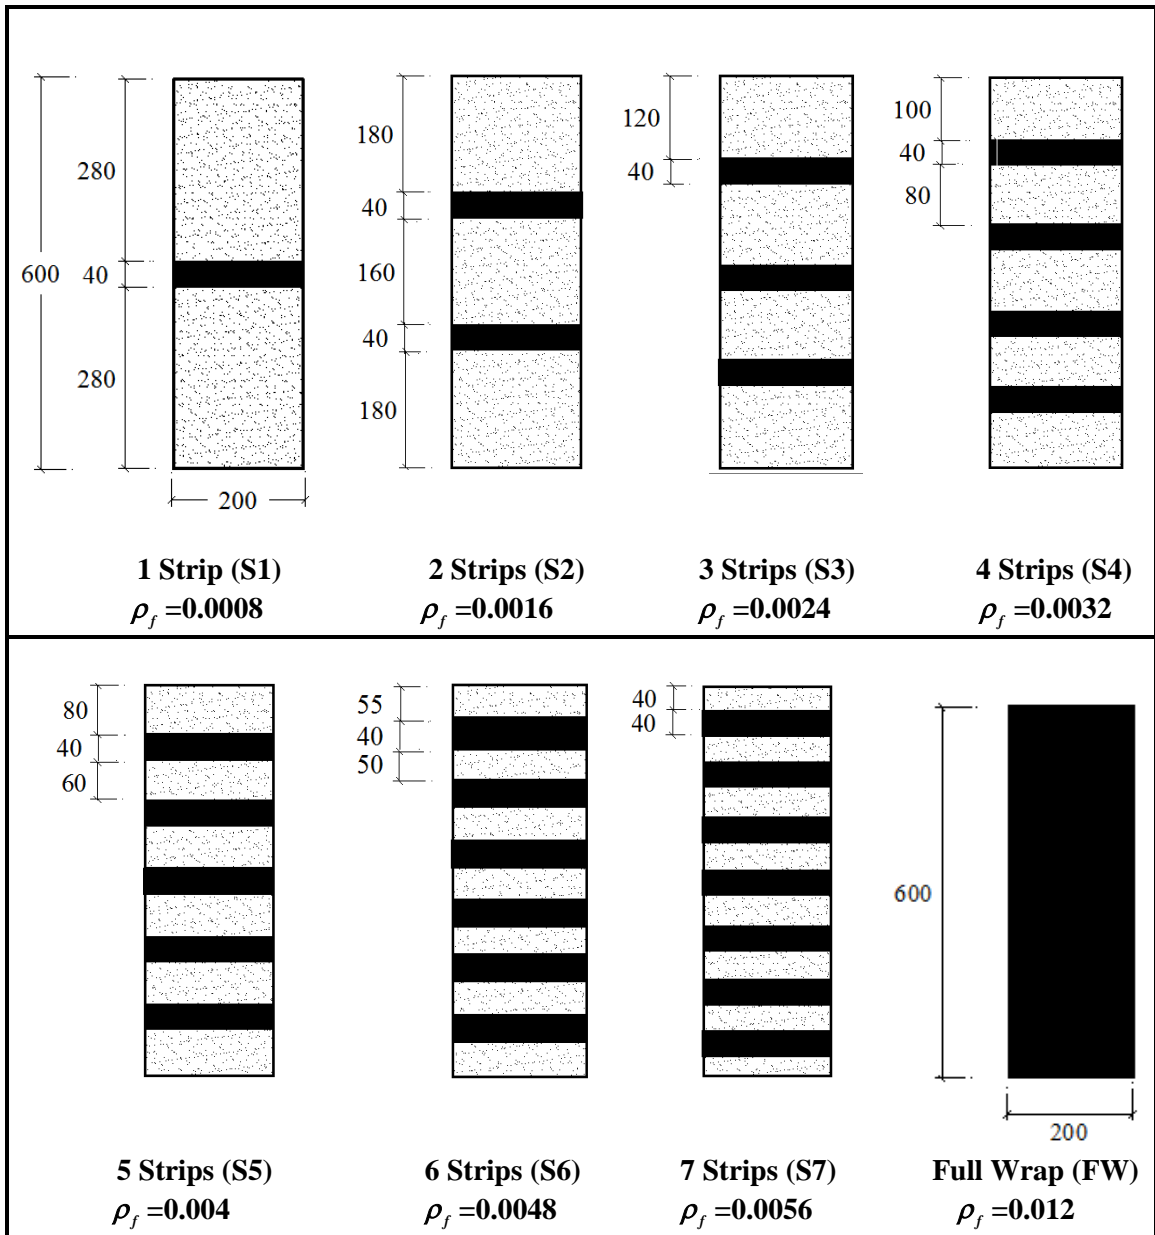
FRP Wrap Layout on circular columns (All dimensions are in mm; 1 mm = 0.039 in.)
